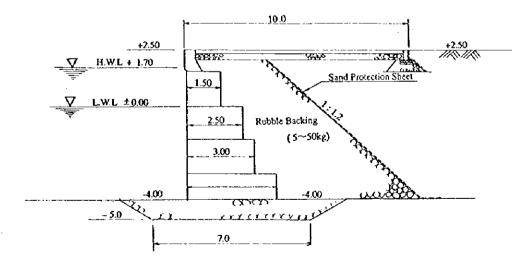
(3) Typical Cross Section of Quaywall (Concrete Block)
